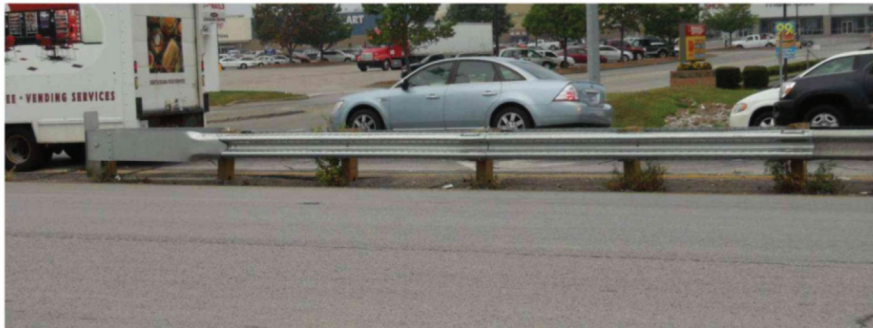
SR135 NB; West side; At Landmark Ave Intersection; Repaired Crash Attenuator; Photo Facing West
